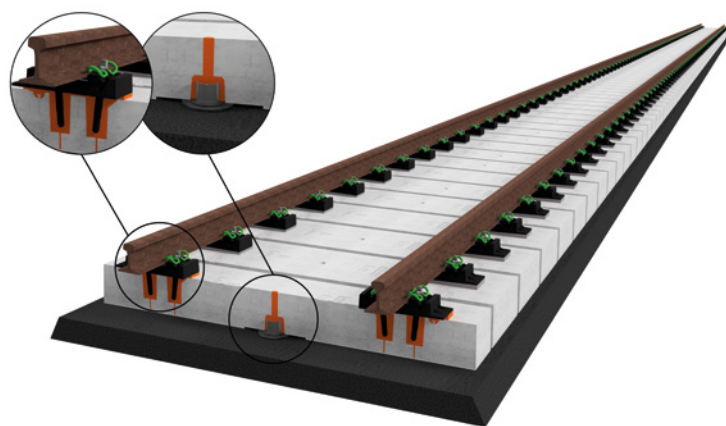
IVES slab track system – details show direct fastener type Vossloh DFF 300 RS and the stainless-steel dowel embedded in the asphalt layer providing additional longitudinal and lateral fixation, both held in place by a fast-setting grout, depicted in orange. (Copyright RSRG).
